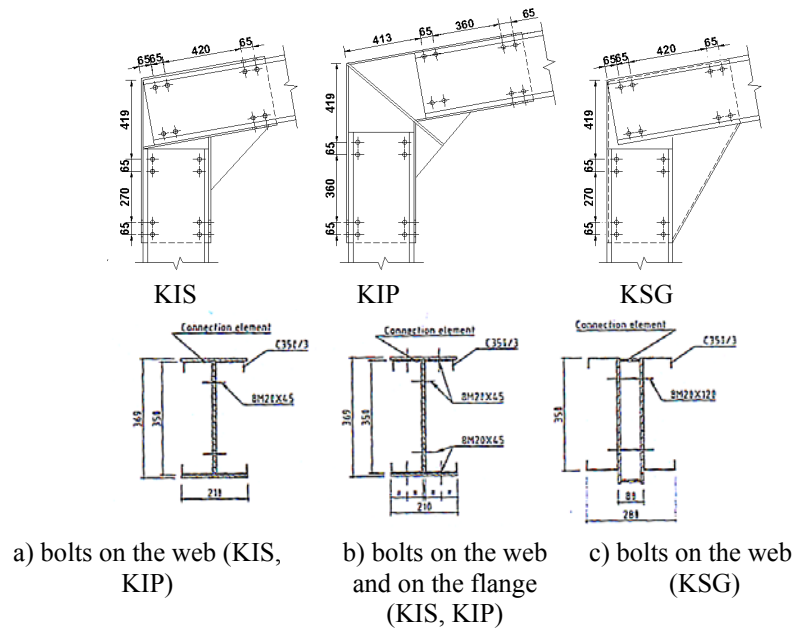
Eaves joints after Dubina *et al* (2004), p.382: KIS- welded I section, KIP- welded I section with plate bisector, KSG-spaced gussets,
